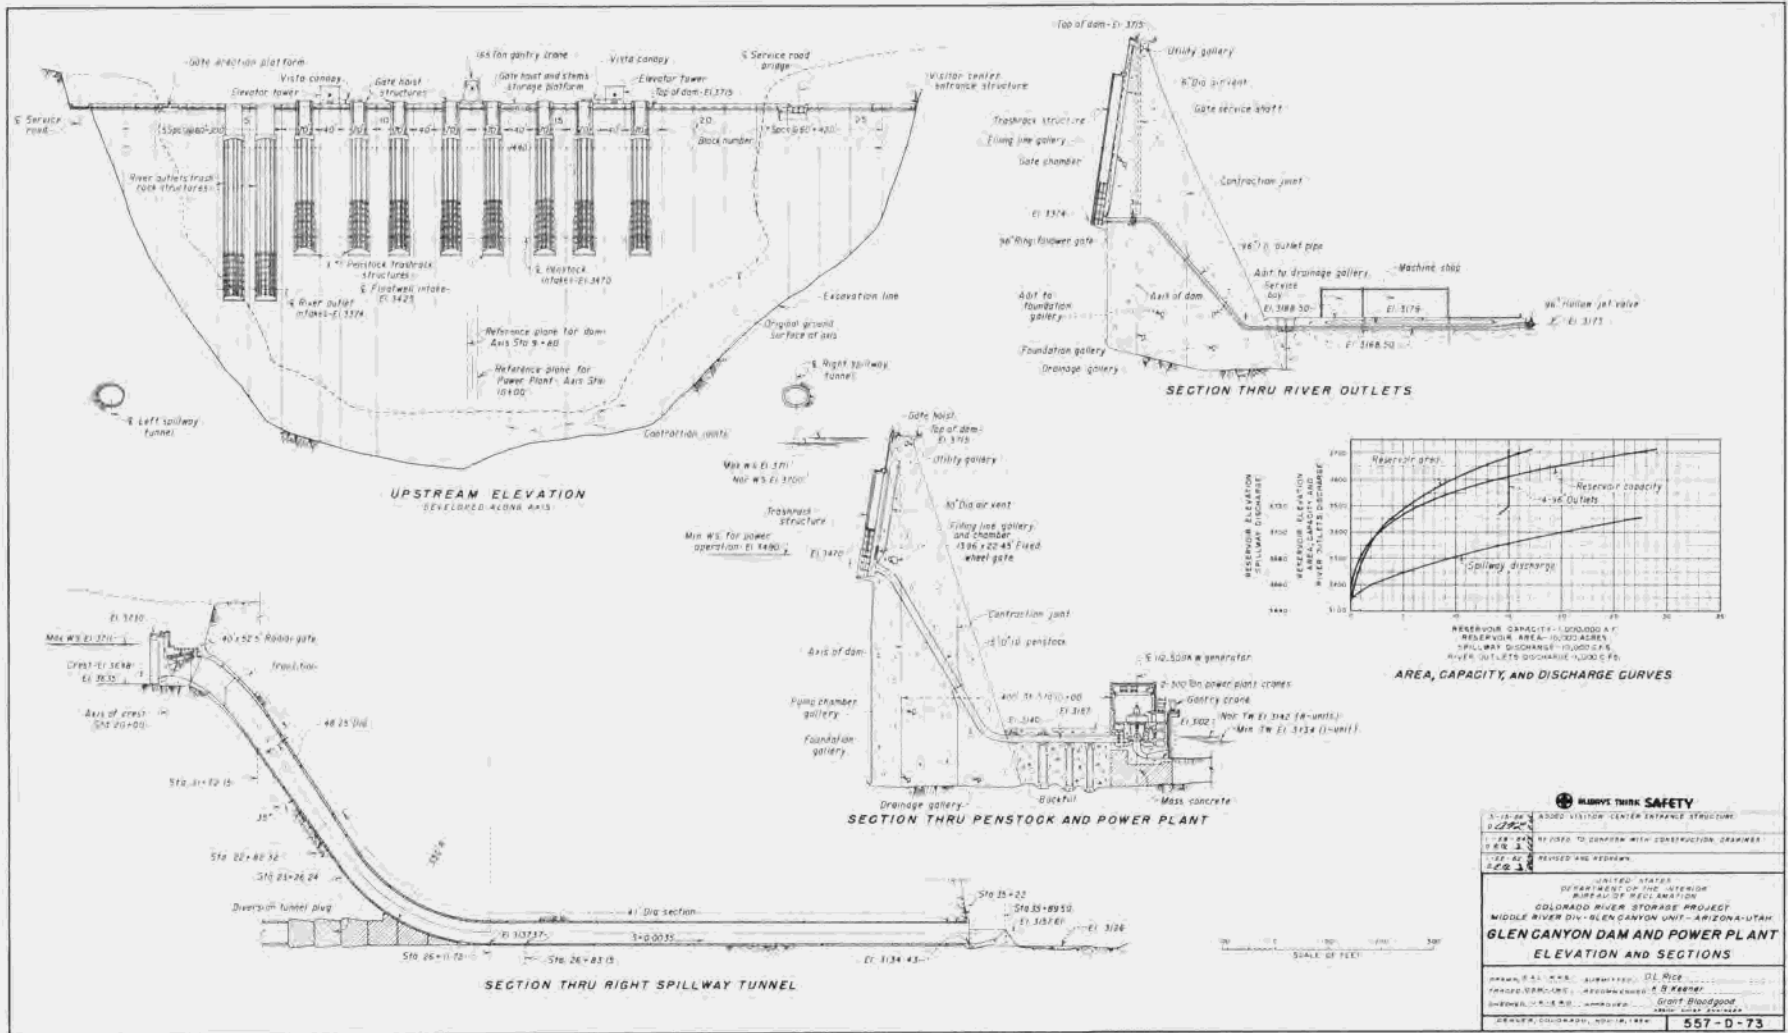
Glen Canyon Dam and Powerplant—Elevations and sections.
